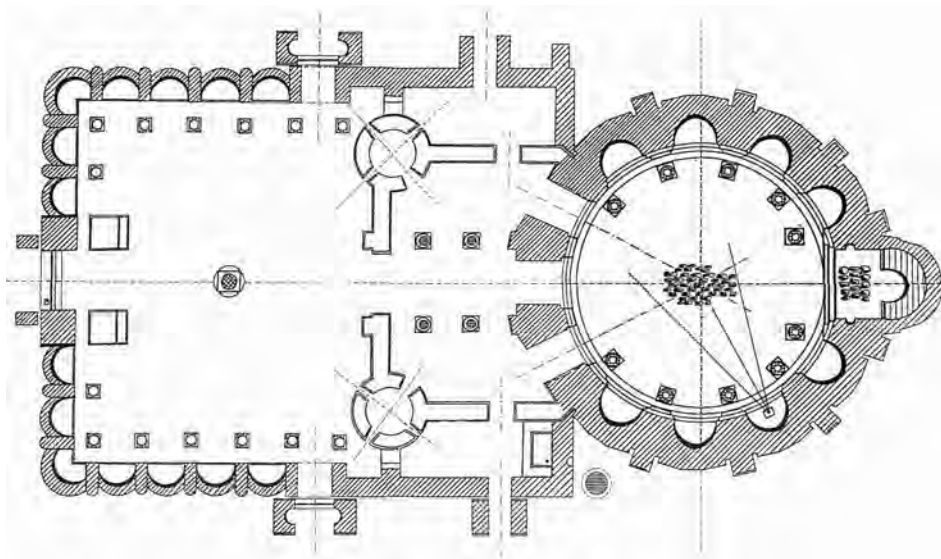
Round church in Preslav. Ground plan (K. Mijatev).
